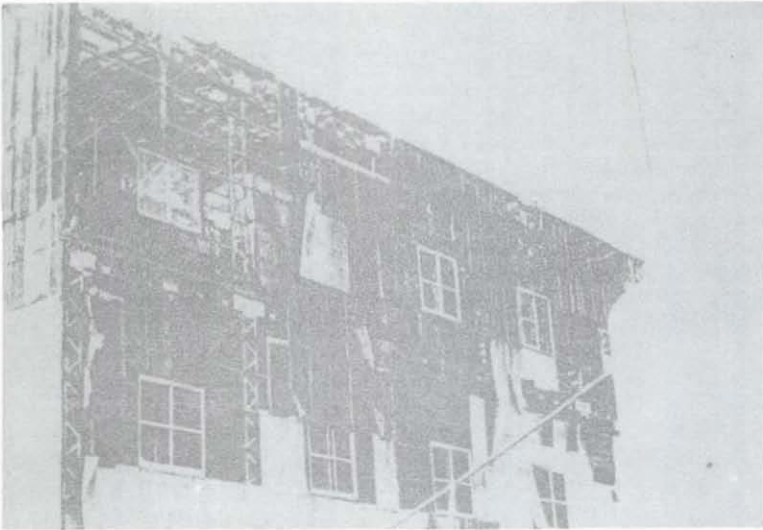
DAMAGE TO SHEET METAL SIDING OF A STEEL FRAME FACTORY
